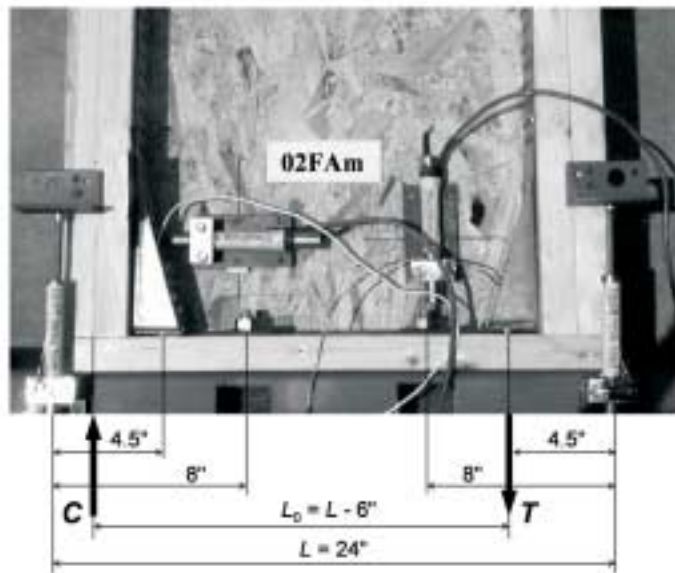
Anchorage and effective length of 0.6-m (2-ft.) wall.
